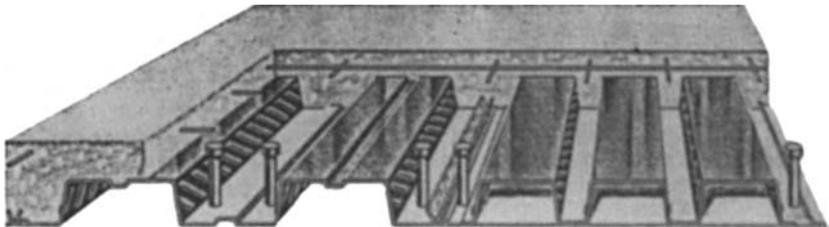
Blended deck, alternating cellular and noncellular panels, in composite construction.
